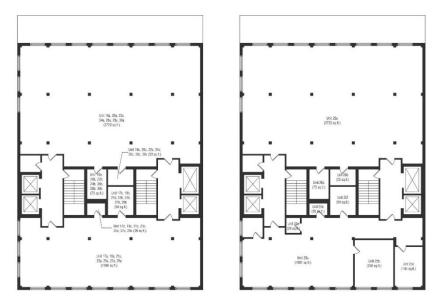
, 531 (left to right): Building 17, twelfth floor (1915); same floor (1984); 1" = 32'. North is down.
